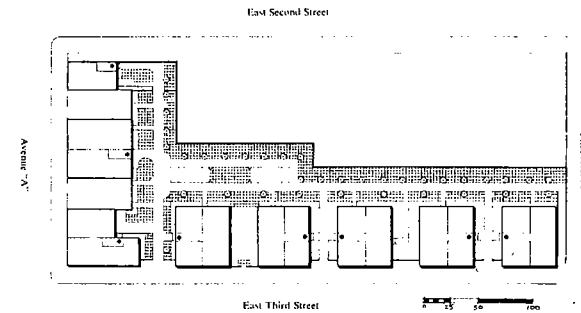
Site plan of First Houses. (Courtesy of New York City Housing Authority)
